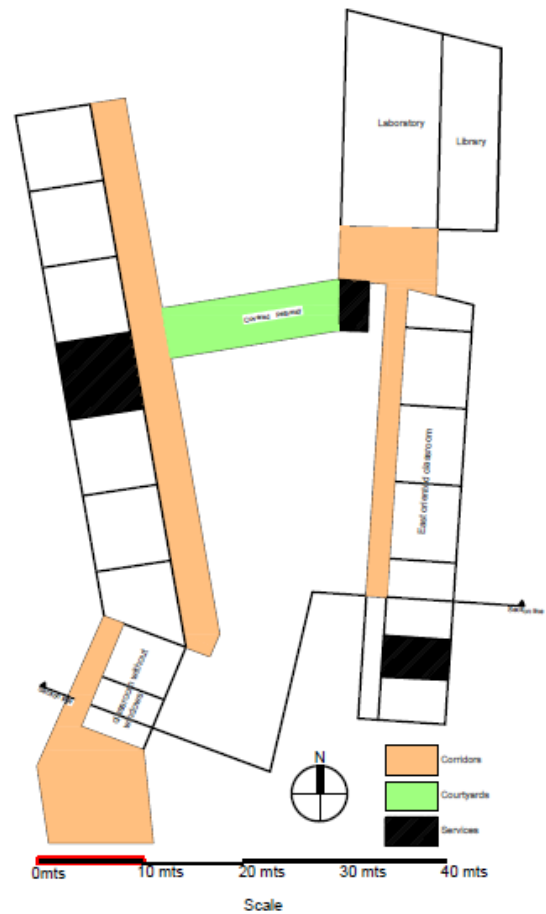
Layout plan of Case I showing the corridor & courtyard. Source: Author
